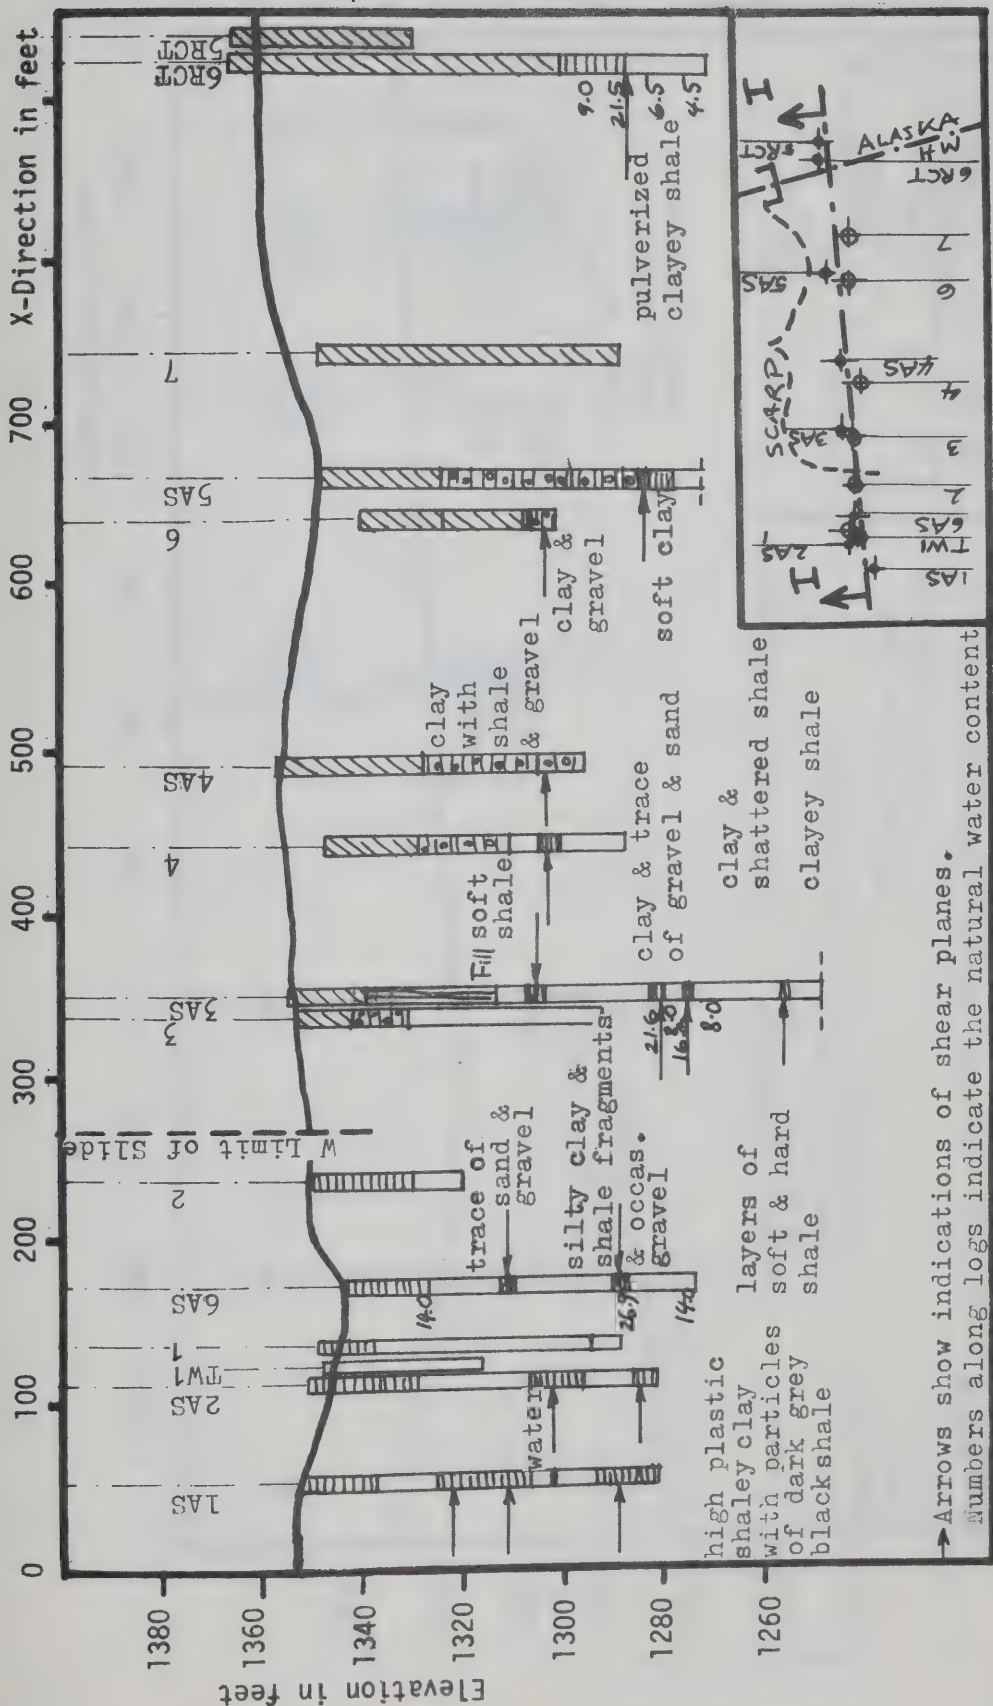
FAILURE OF PEACE RIVER BRIDGE AT TAYLOR, B.C.: PLAN-VIEW OF SLIDE AREA.
